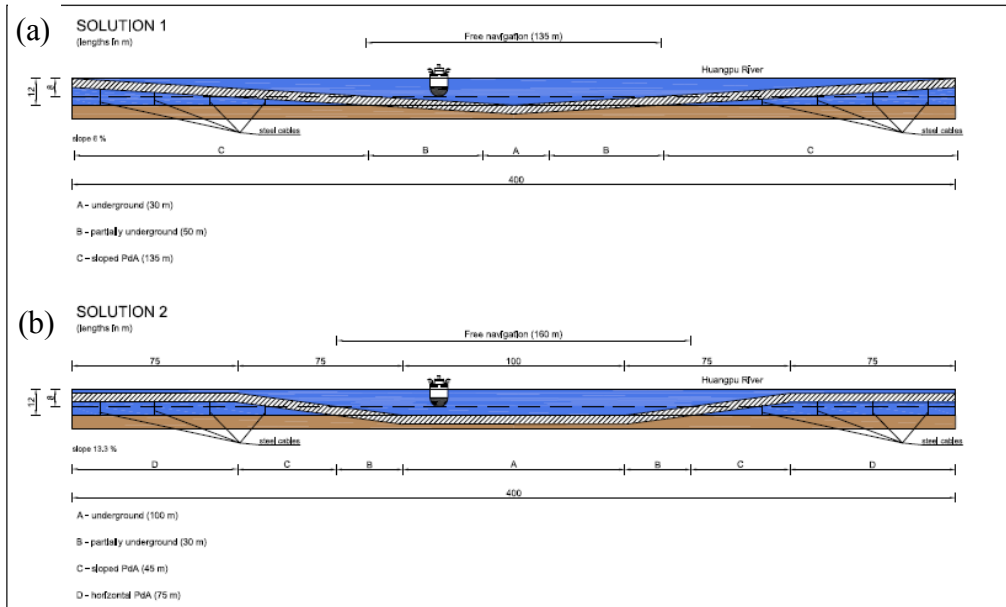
Longitudinal lay-out solutions proposed for the Archimedes Bridge crossing the Huang Pu river in Shanghai (PR of China).
